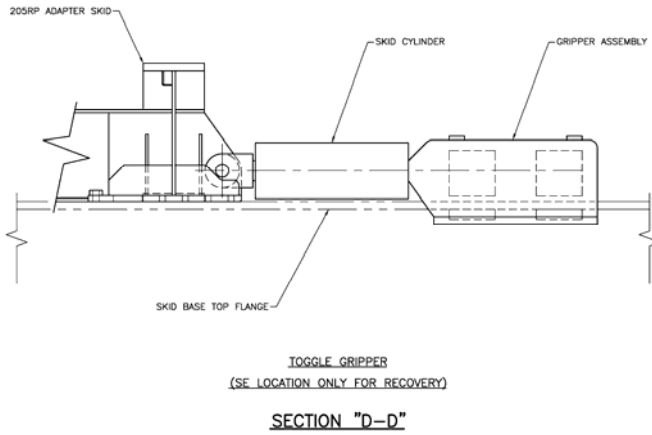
Rig gripper system (see plan in Figure 1 for location)
